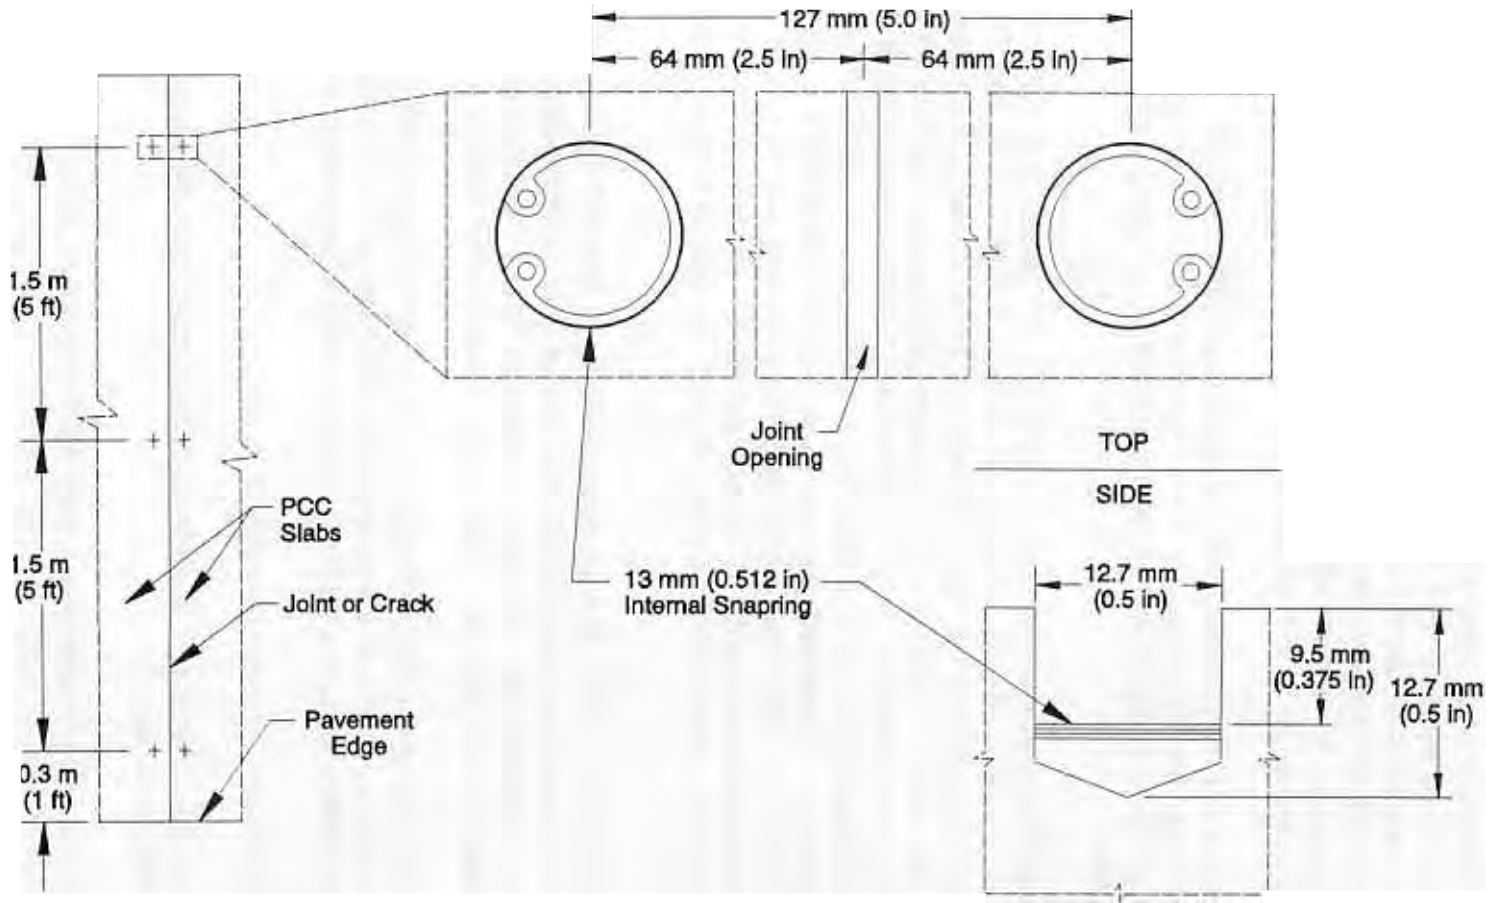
Snap Ring Placement for Measuring Joint Openings - PCC Pavements
